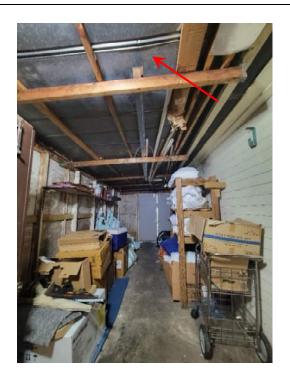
Improper Use of Standing Seam Metal Roof as Structural Decking
